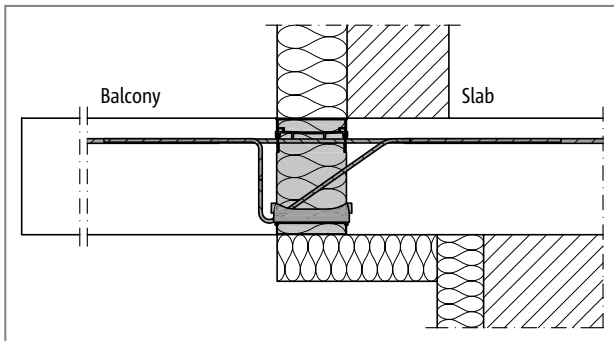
Schöck Isokorb® XT type K: Connection with indirectly positioned floor and thermal insulation composite system (WDVS)
